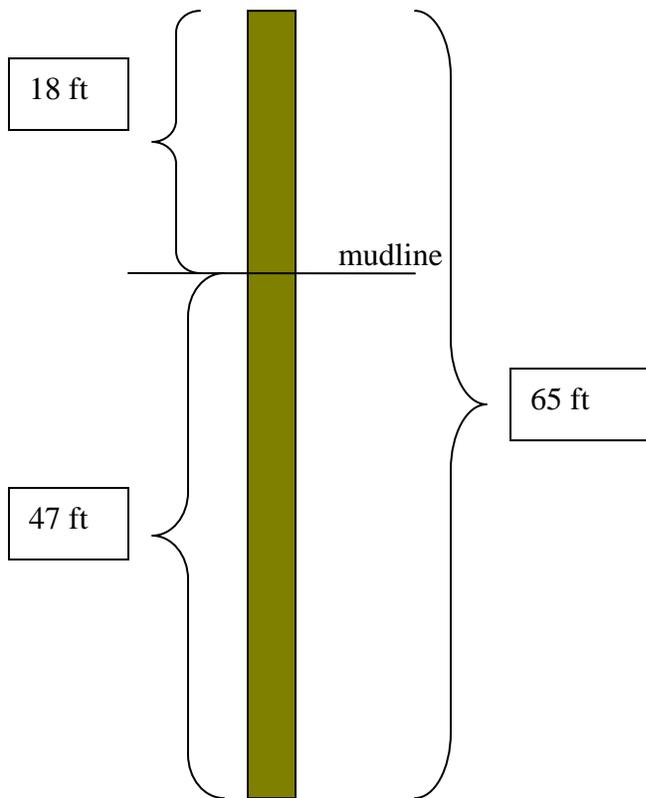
Schematic of proposed breakwater replacement (same for Alternatives D & E)
